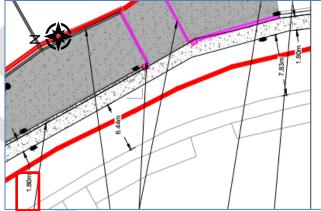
Extract of Proposed Footway widths from preliminary design drawings
